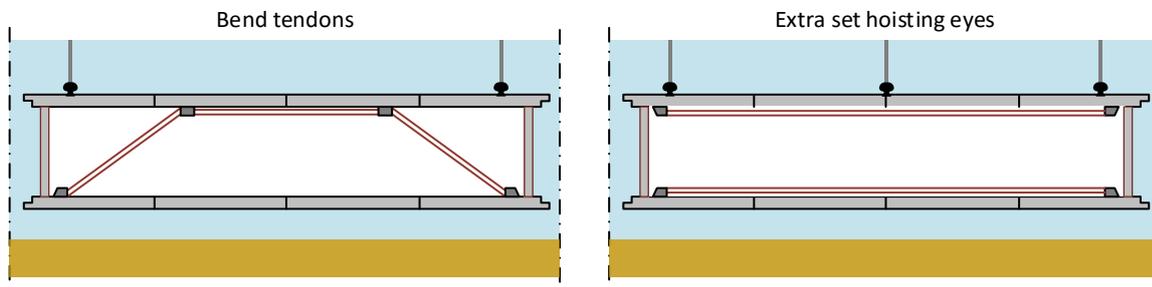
, PRESTRESSING DESIGN VARIANTS (2/2) ; LONGITUDINAL VIEW
